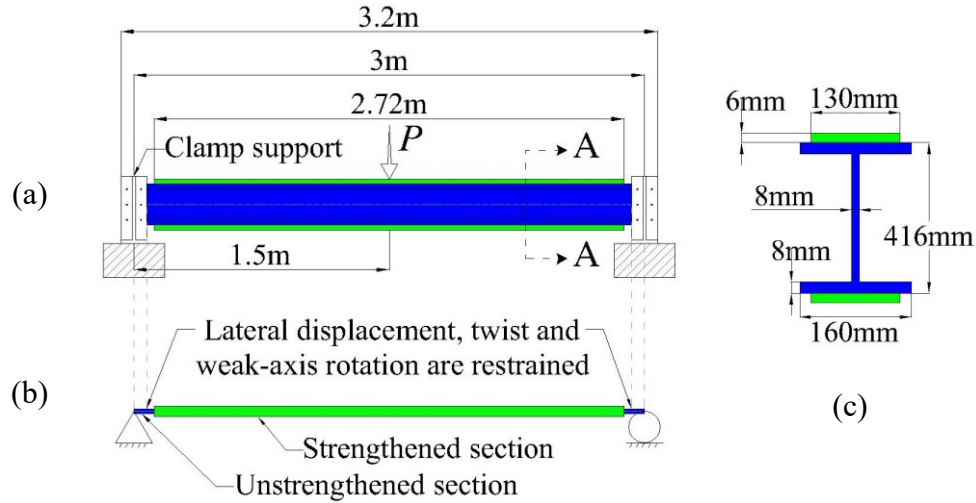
Specimen BI-S2 (adapted from Wang et al. 2015) (a) Test details, (b) Idealized model, and (c) Cross-sectional geometry (Section A-A)
